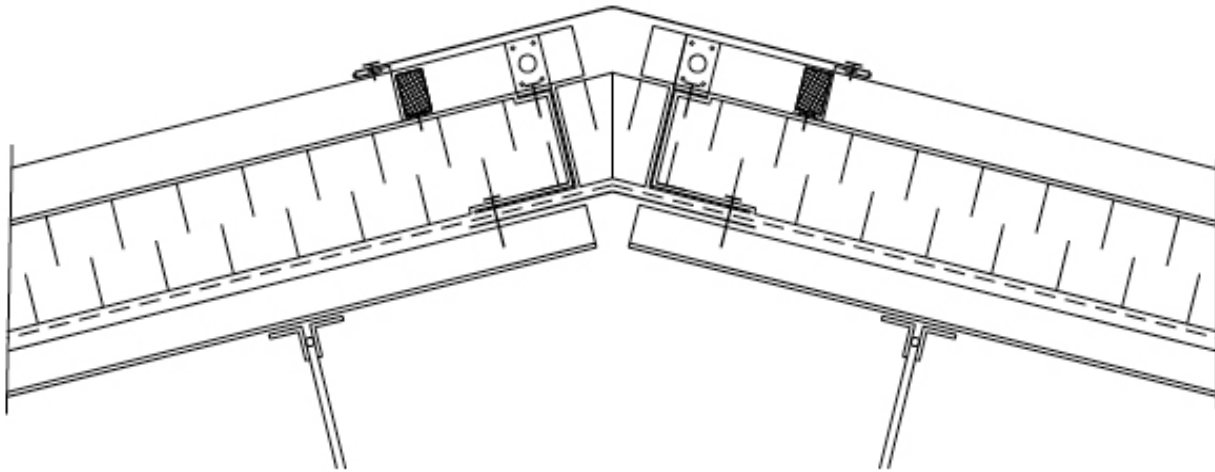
A: Ridge - ExpansionInstallation/Assembly Notes:
